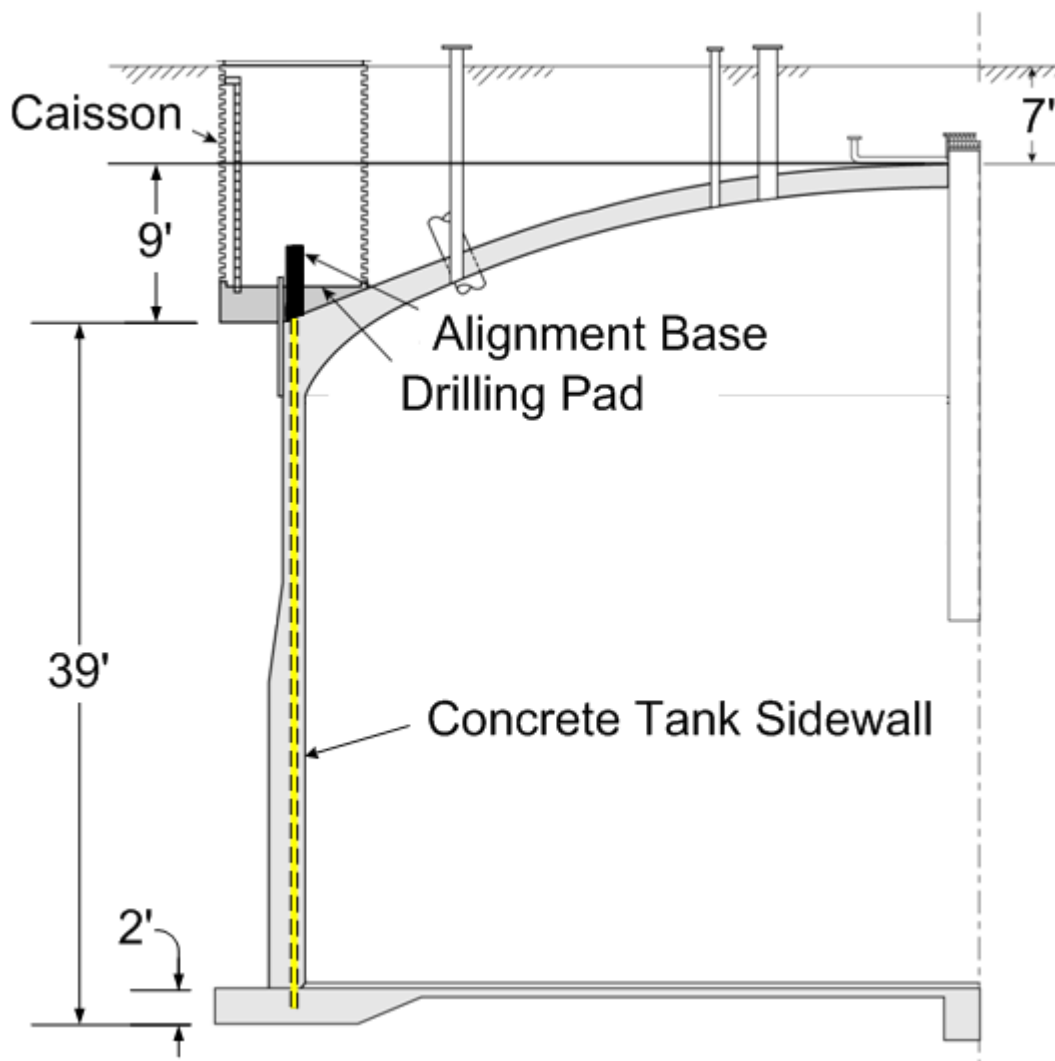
A-106 (Type IVb) SST Sidewall Coring Schematic
